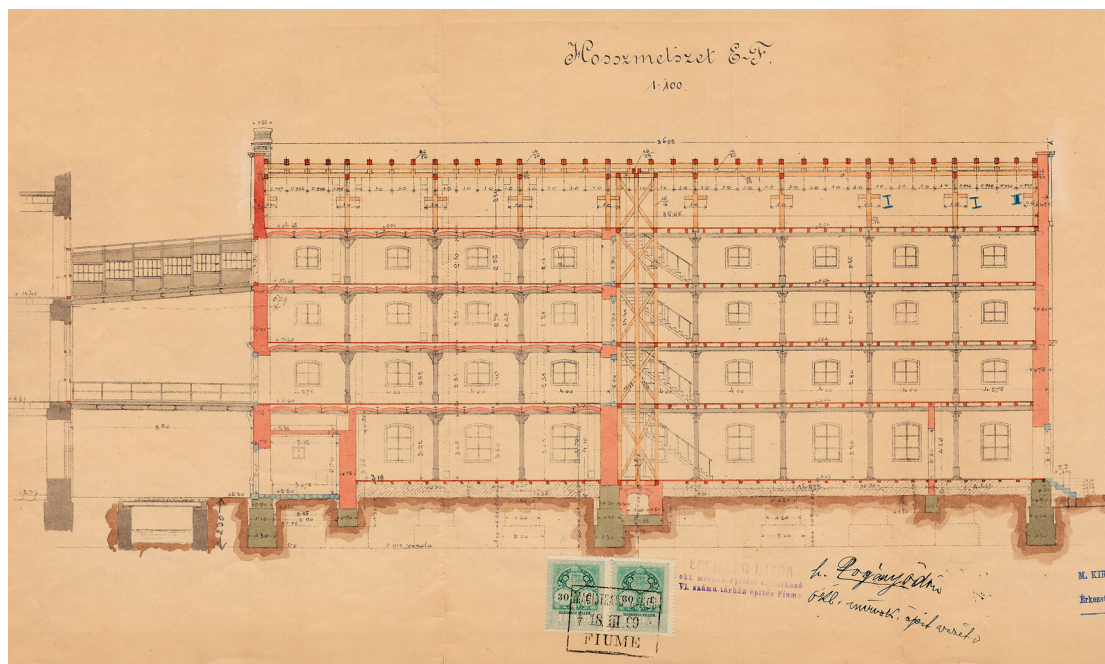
Tobacco drying facility, longitudinal section through old (right) and new (left) part of the building. State Archives in Rijeka (HR-DARI), reproduced with permission.
